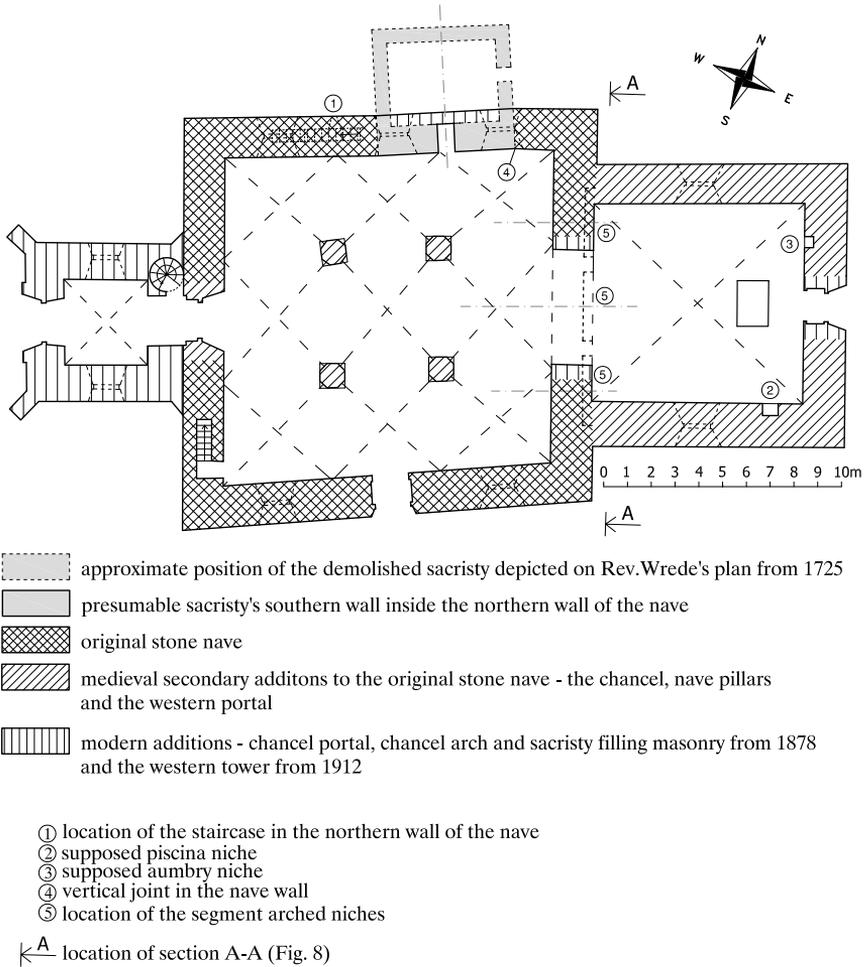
Ground plan of Jõelähtme church below window level. Plan by Villu Kadakas (based on the plan by R. Jaaksoo).
